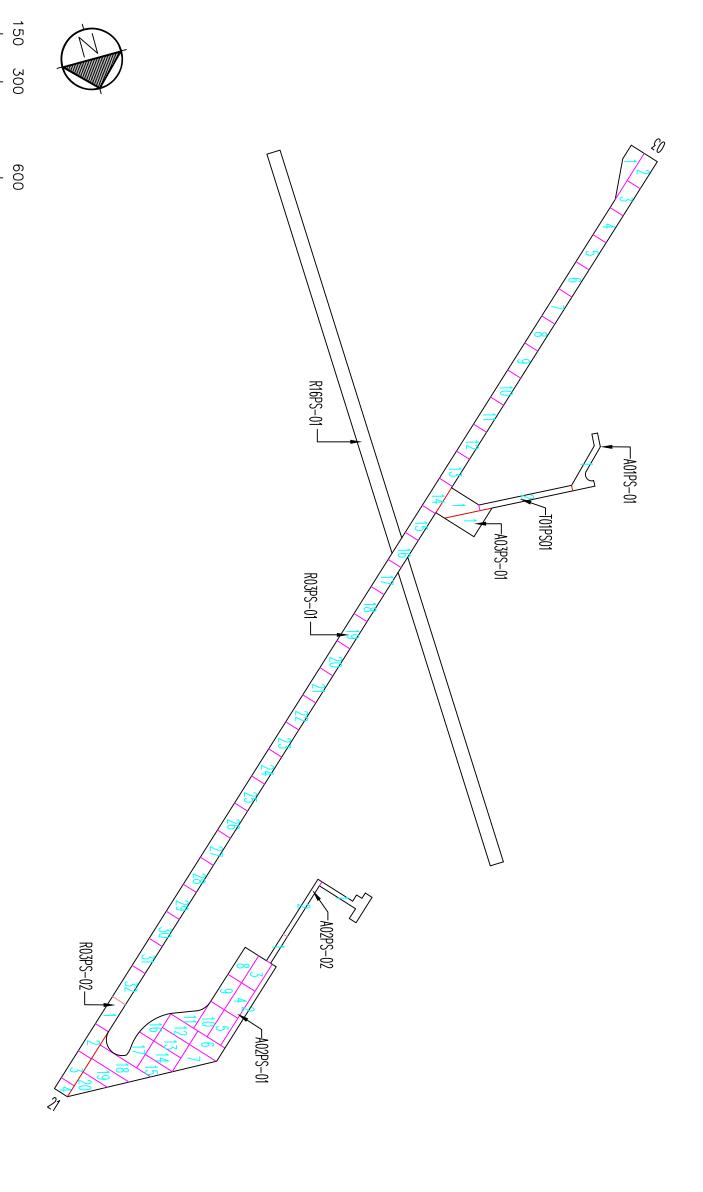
Pavement Branch, Section and Sample Unit Layout. Preston Airport --A01PS-01 /-T01PS01
